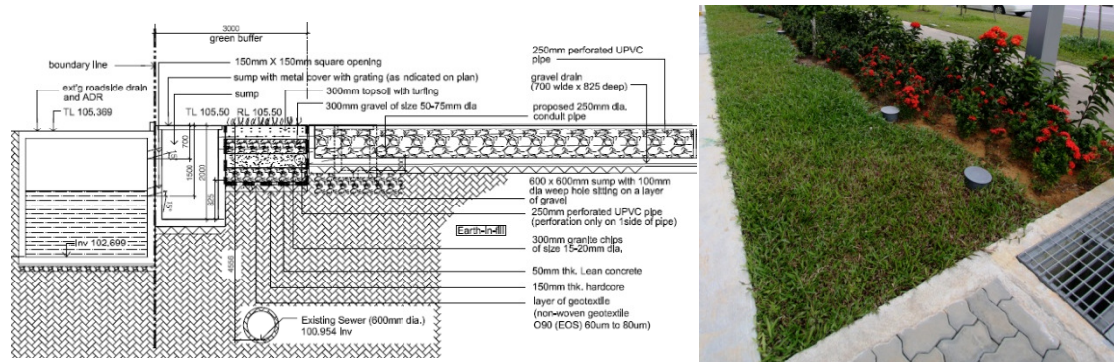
(left) Detail Cross Section and (right) completed gravel filtration system¹².
